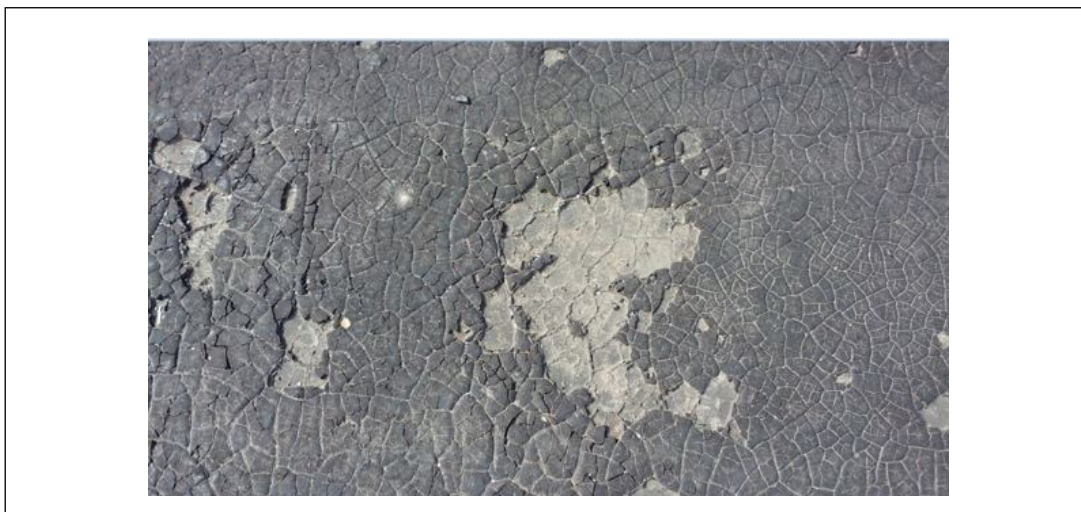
Close-up of hail damage to severely "alligatored" roof (built-up roof)
